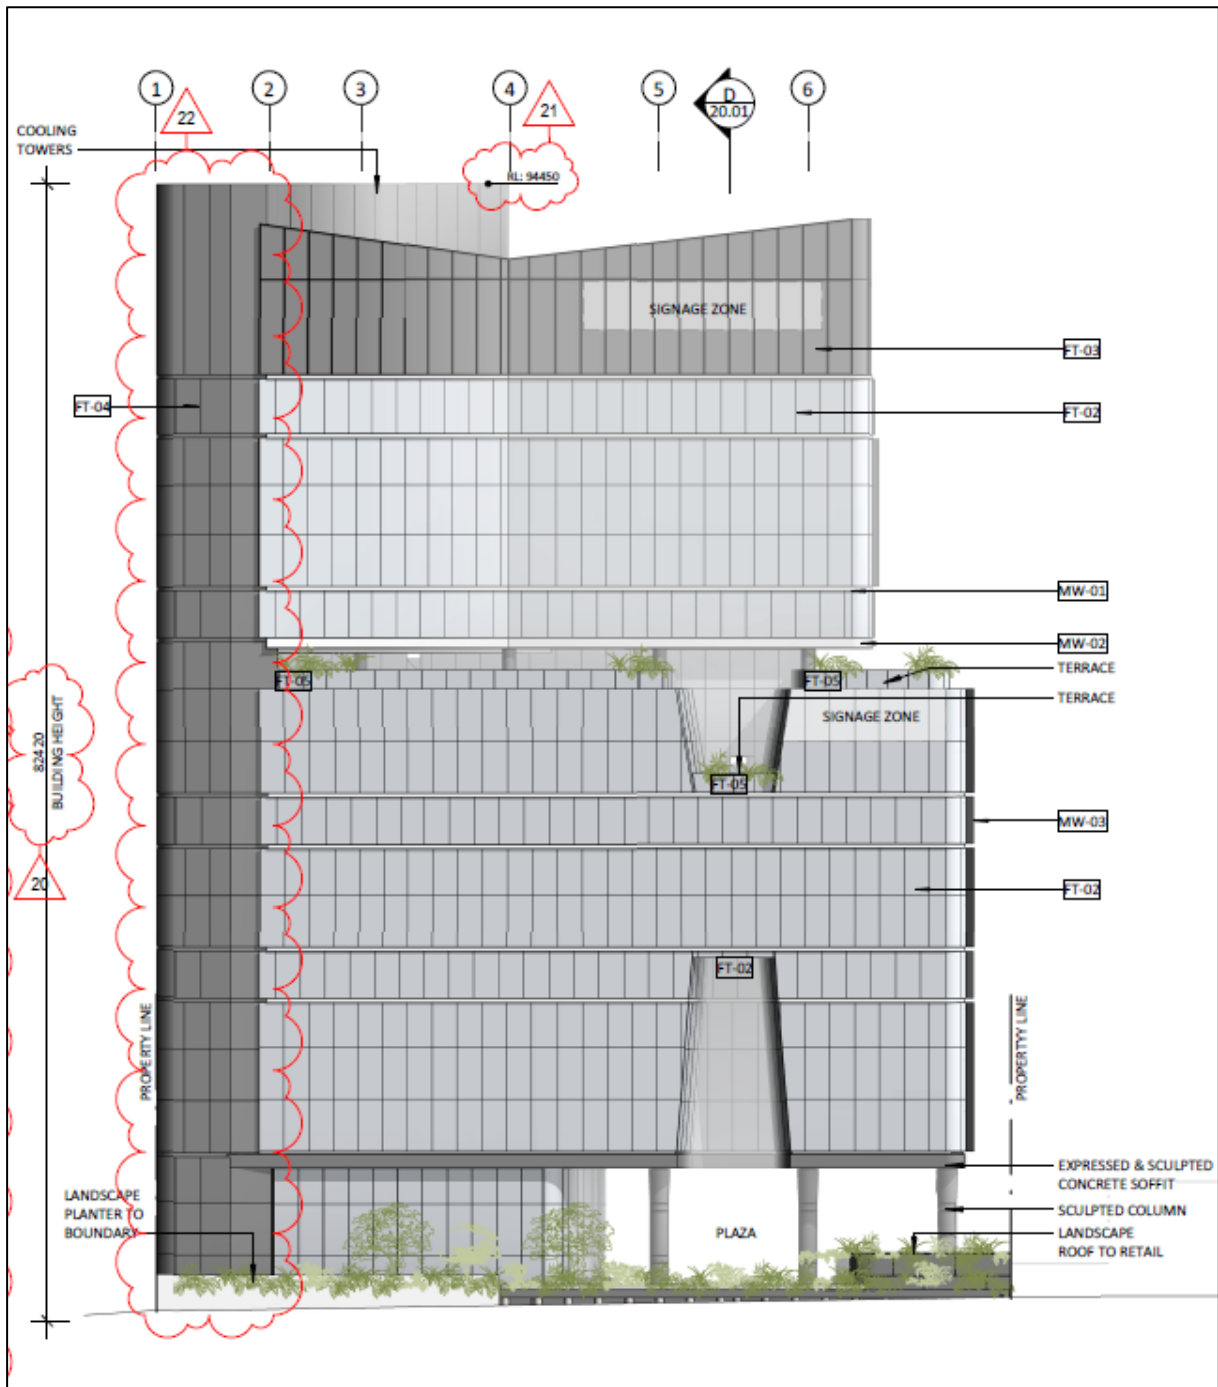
| North Elevation (viewed from Lancer Barracks) (Source: Rts)
